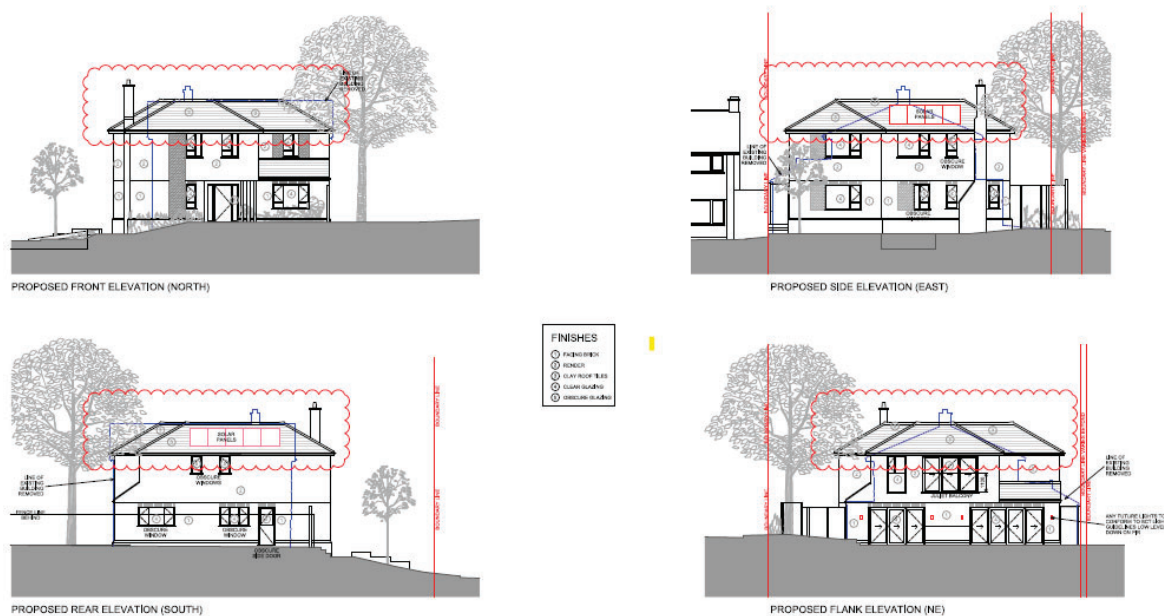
Proposed Elevations (please note – larger version of plan can be found in the Committee Plan Pack)
